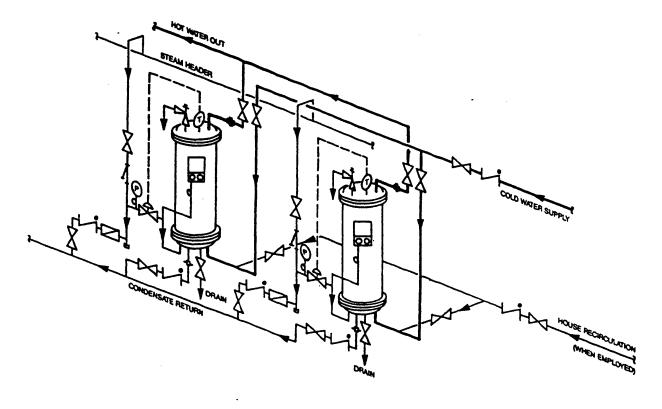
Piping Connections for Parallel Heaters
